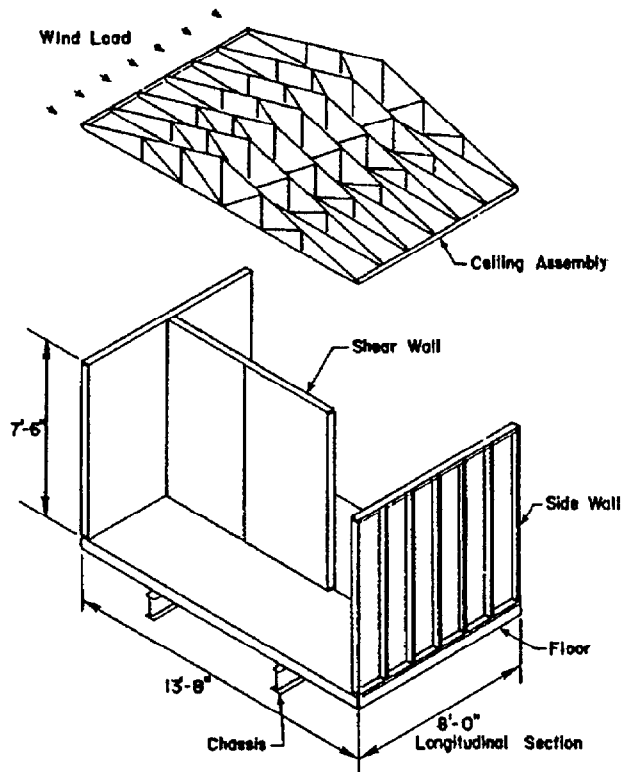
Pictorial View of Test Shear Wall Assembly
